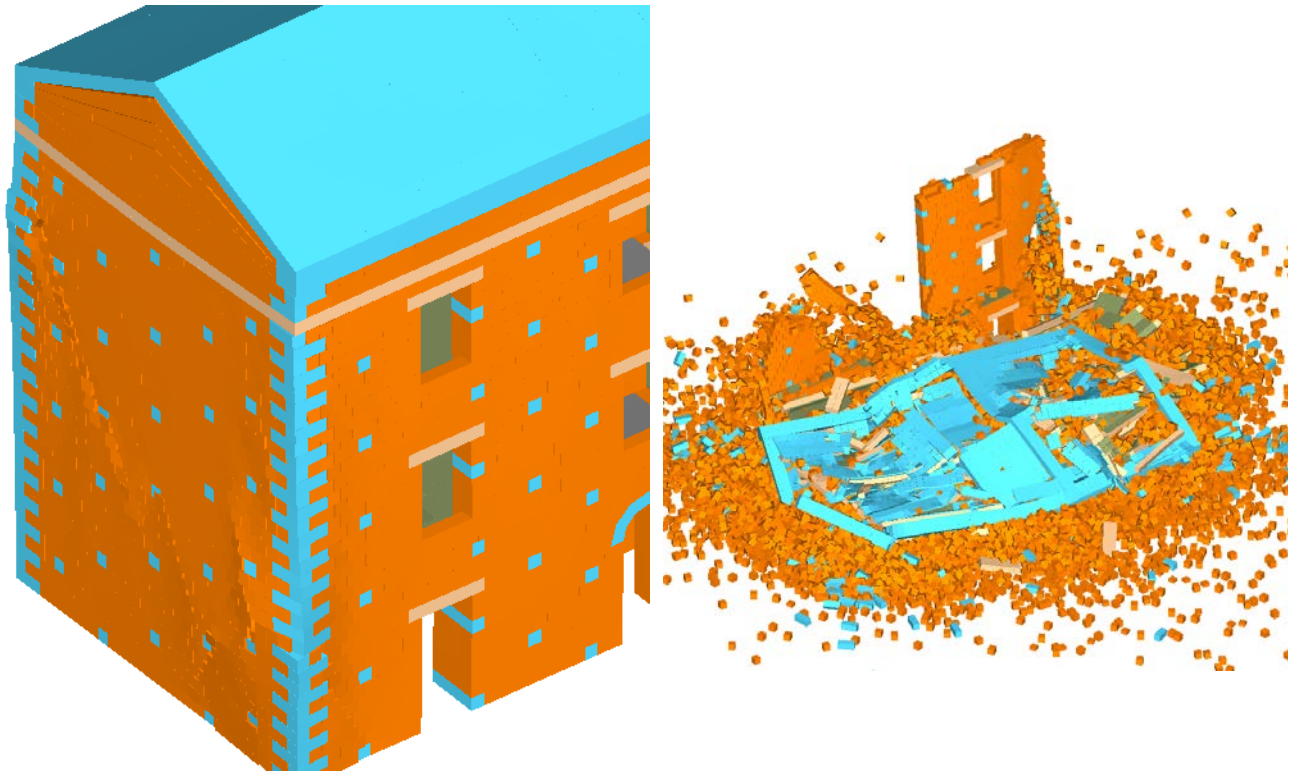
Shear and sub vertical cracks in the masonry (left) and final collapsed shape (right)
